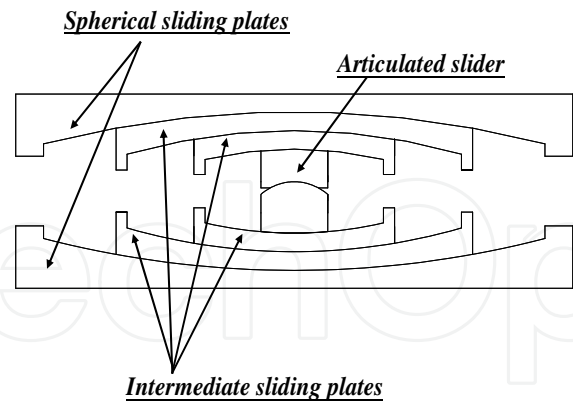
(h). Cross-sectional view of MFPS isolator with six sliding surfaces
